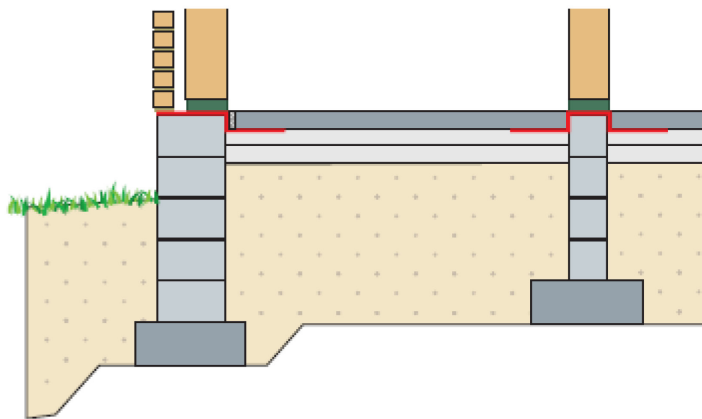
Membrane sealing the gaps between the foundation and the base floor slab (Arvela et al, 2009).
